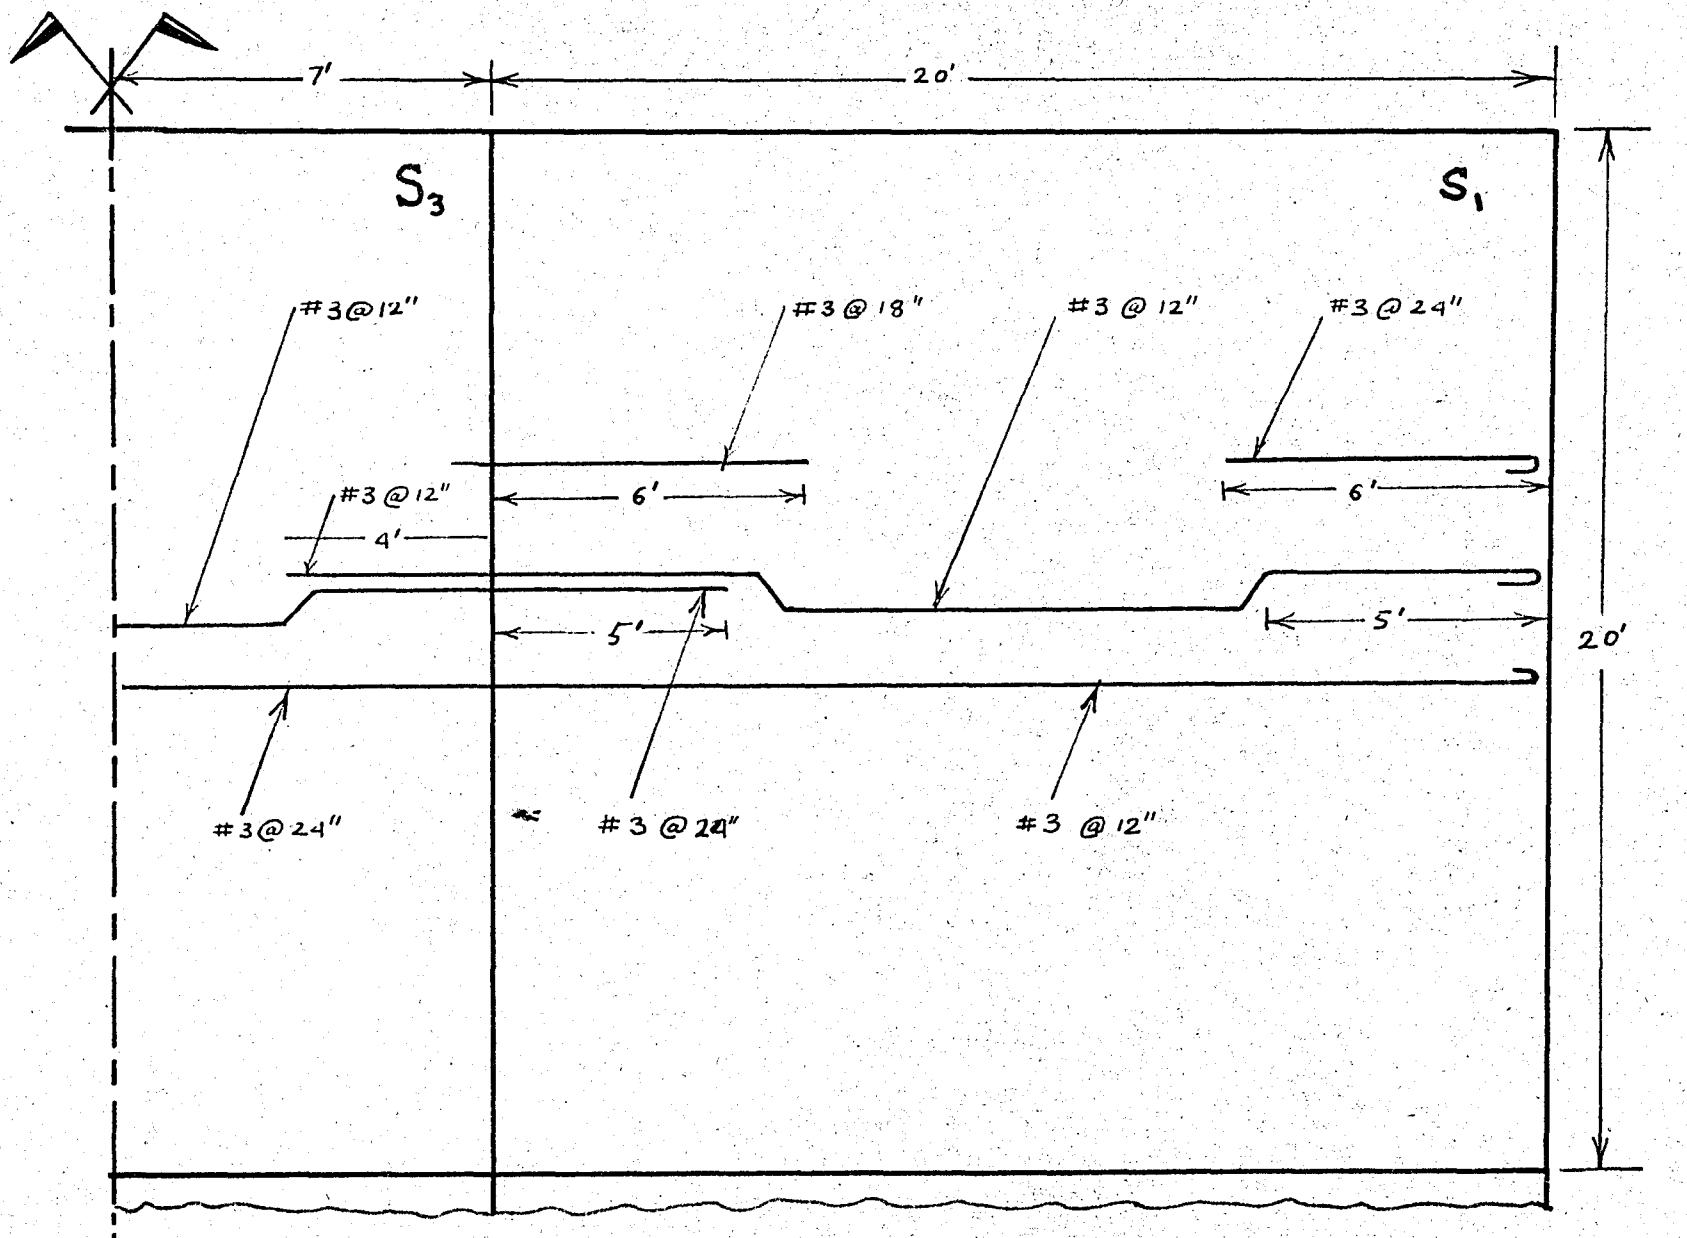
S_1 and S_3 Steel Reinforcement
